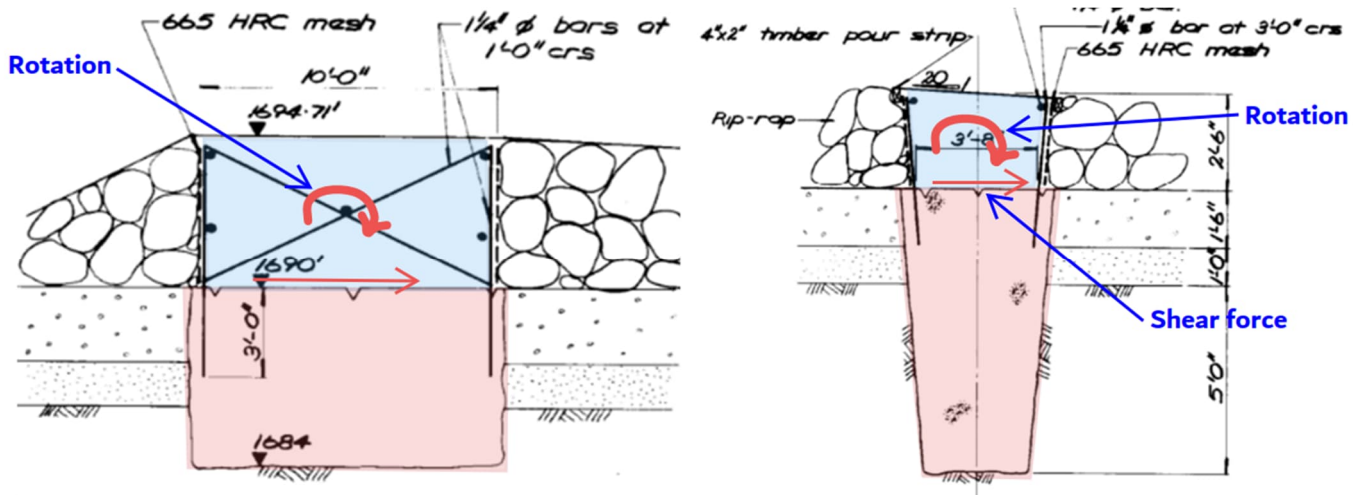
Weir and rib (sill) concrete structure showing loads to be resisted by concrete caps
